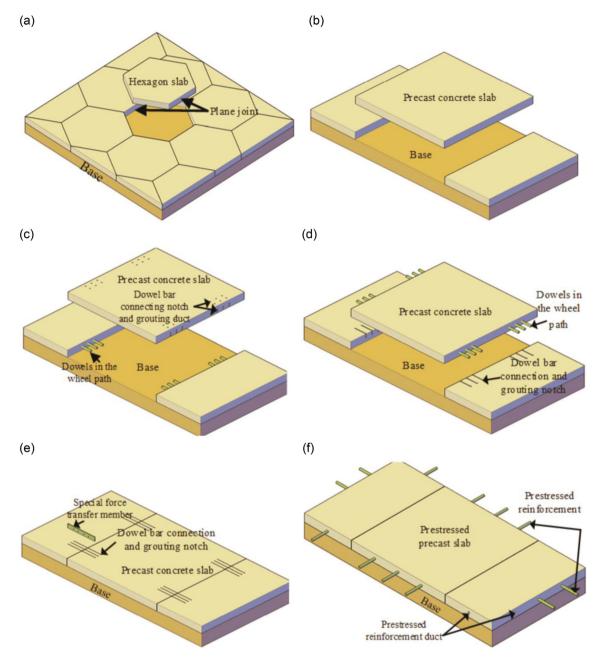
Typical precast slab systems. (a) Hexagon slab. (b) Rectangular slab. (c) Super-slab. (d) Michigan slab. (e) Uretek stitch slab. (f) Prestress slab.
